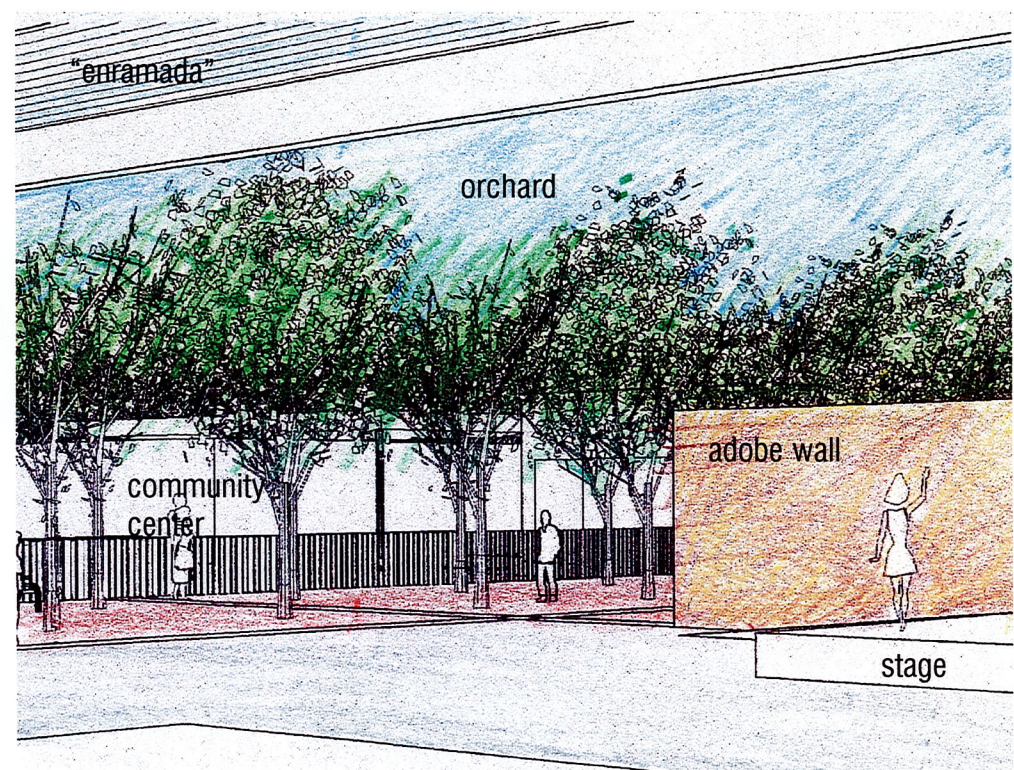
View of Stage and Adobe Wall from under "Enramada"
